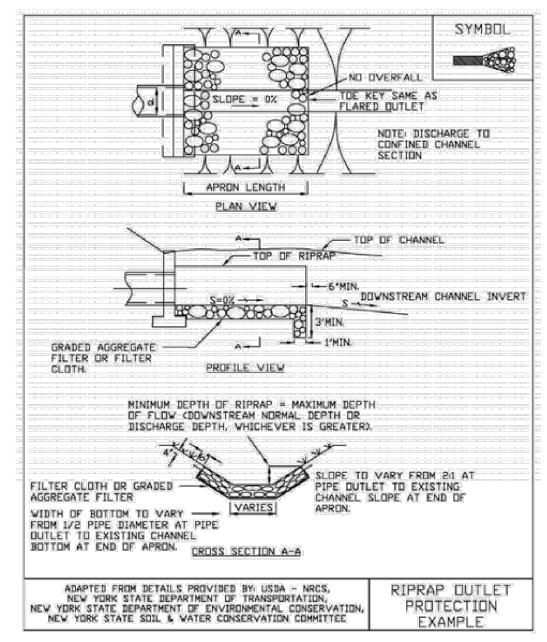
Riprap Outlet Protection Detail (1)
